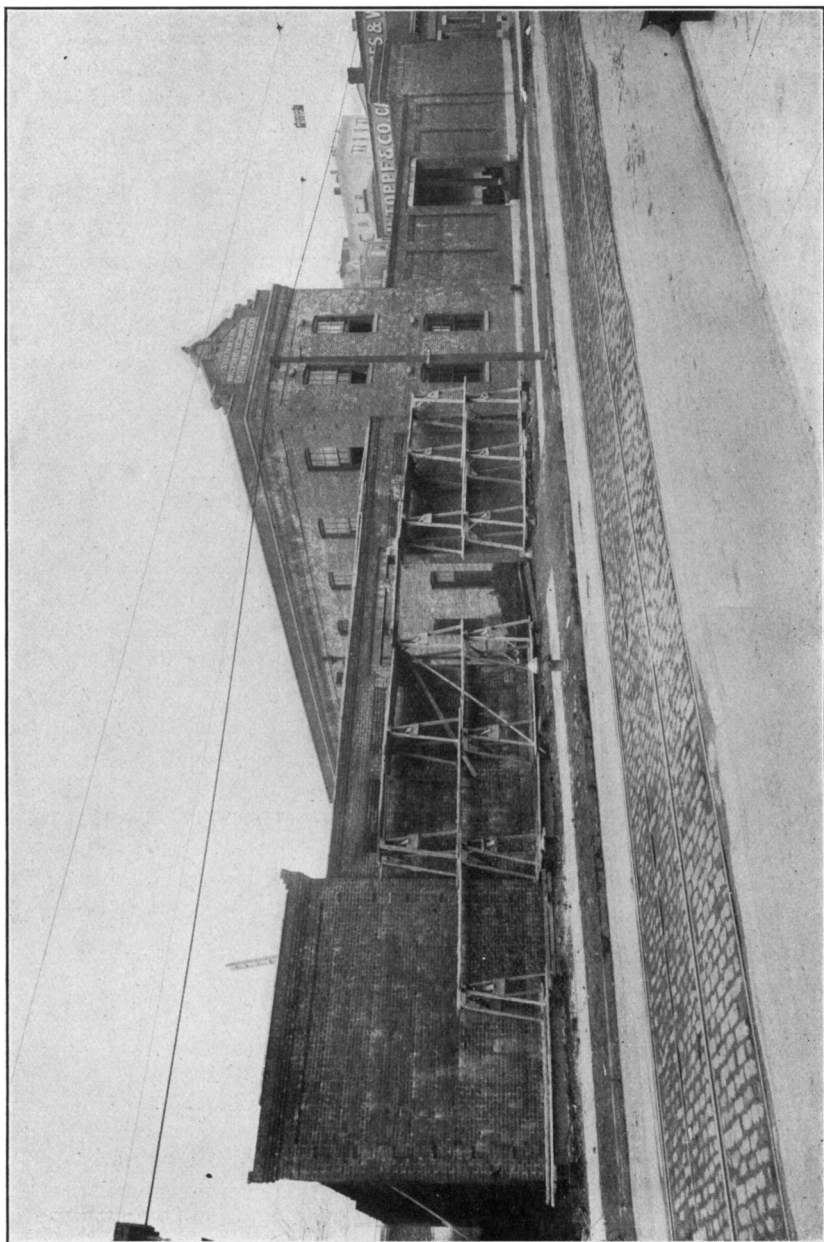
EAST NEW YORK REPAIR YARD, BOROUGH OF BROOKLYN. EXTERIOR VIEW. UNDER CONSTRUCTION
